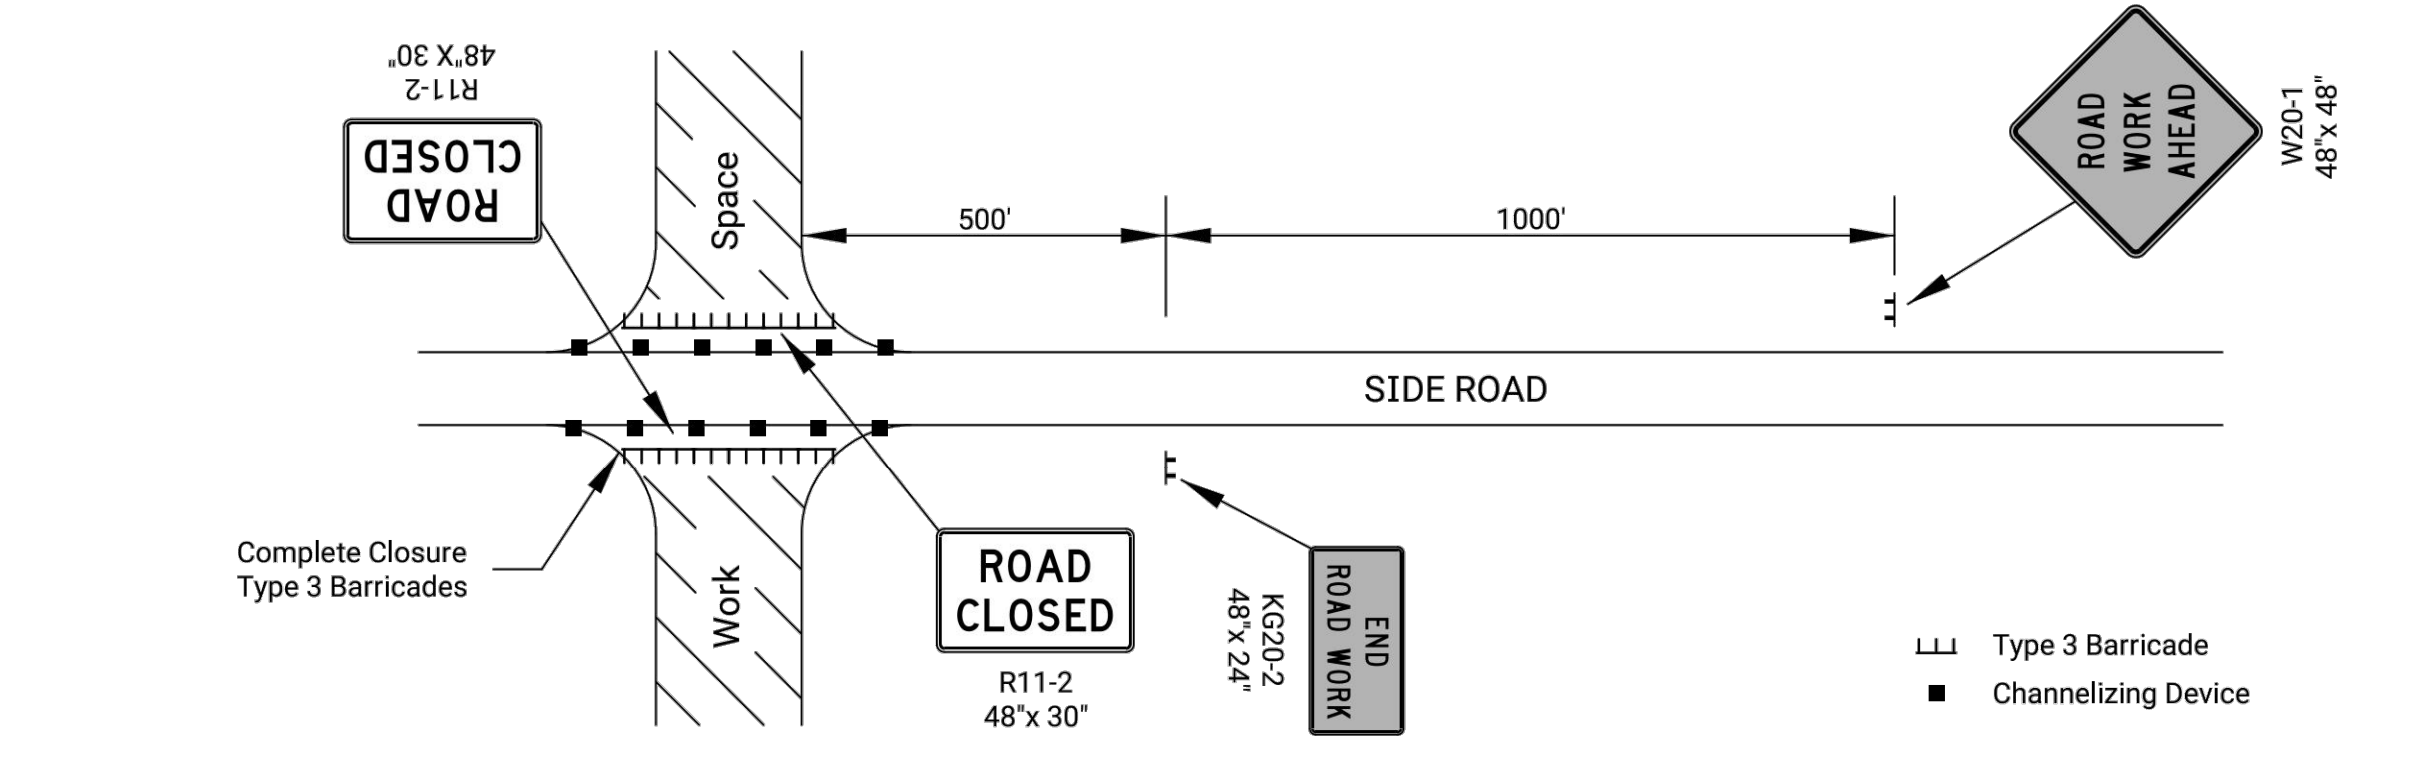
TYPICAL SIGNING FOR SIDE ROAD OPEN
